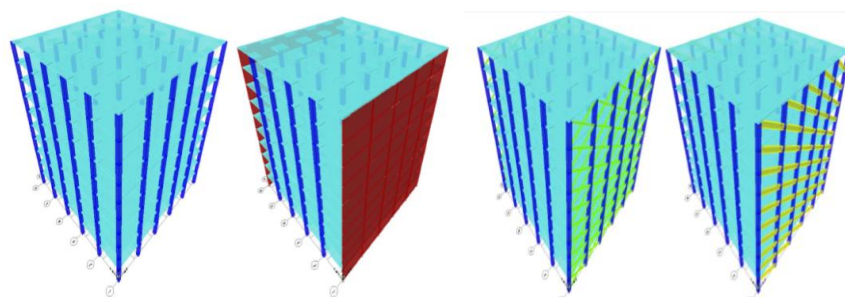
Flat slab with Bare frame, Shear wall, Steel bracings, with Infill wall.
